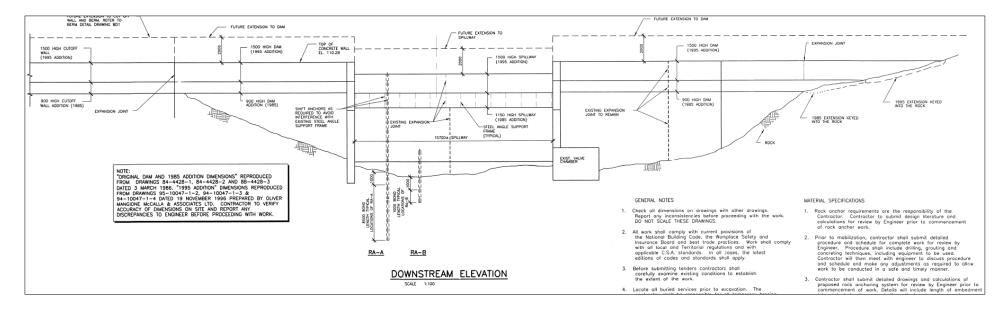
Downstream elevation of project from construction drawings (Trow Assoc. 2005 dwg RA1).
